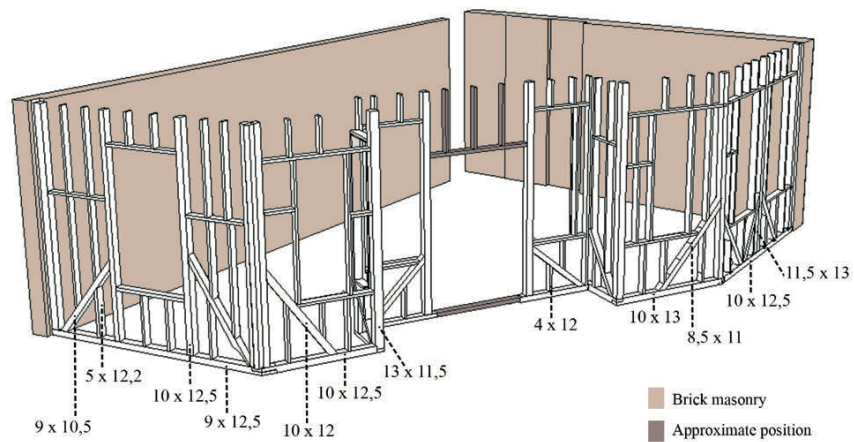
Wall A (left) and wall B (right) of the top floor. Measured and drawn by the author.
